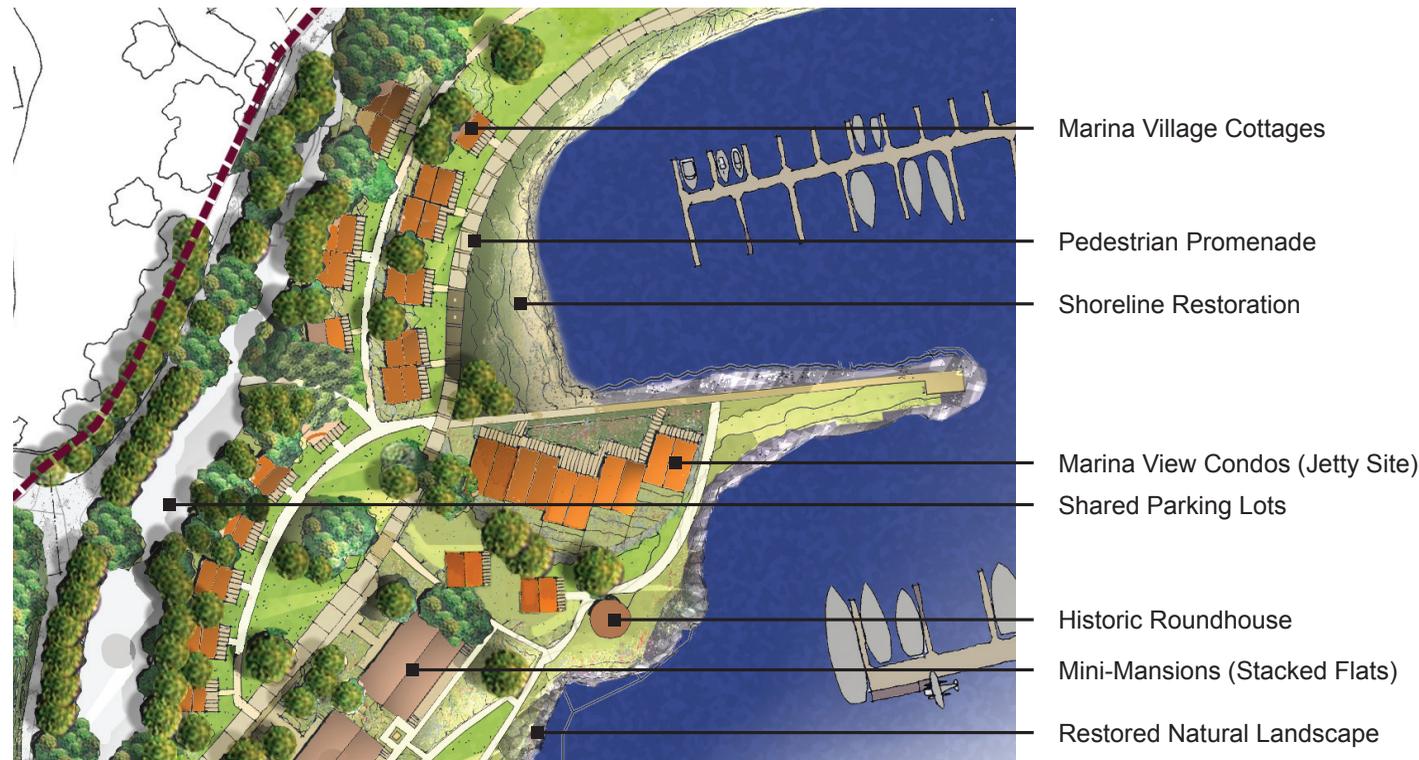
Detailed Site Plan of Marina Village Area
